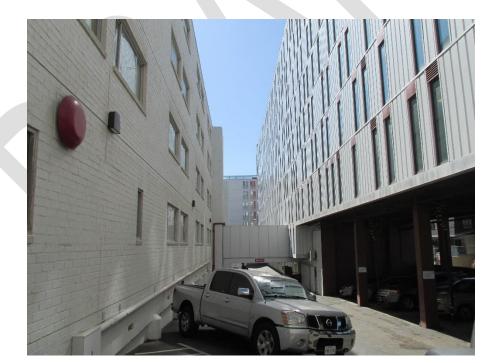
Indiana Avenue Wing: east elevation (right) and alley, showing hallway connection to main hotel volume, looking south (IMG_8814)
